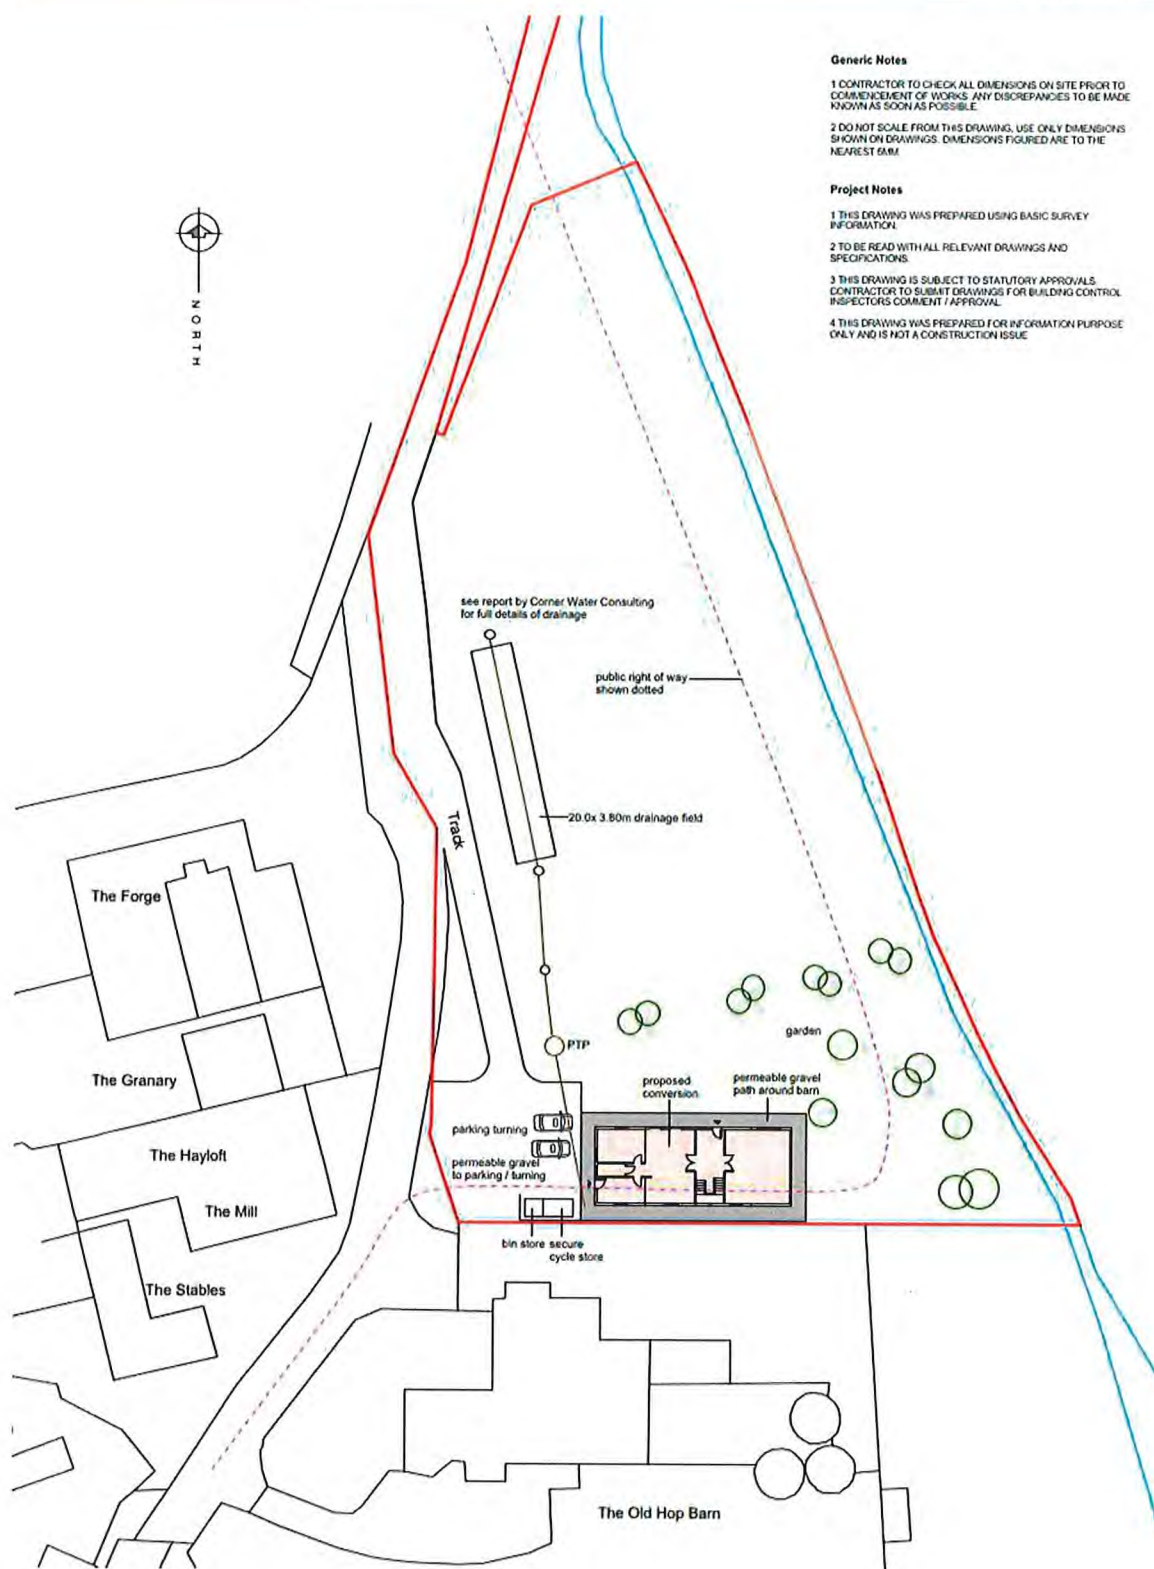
Site Plan (Source Drawing 1896.01B)
